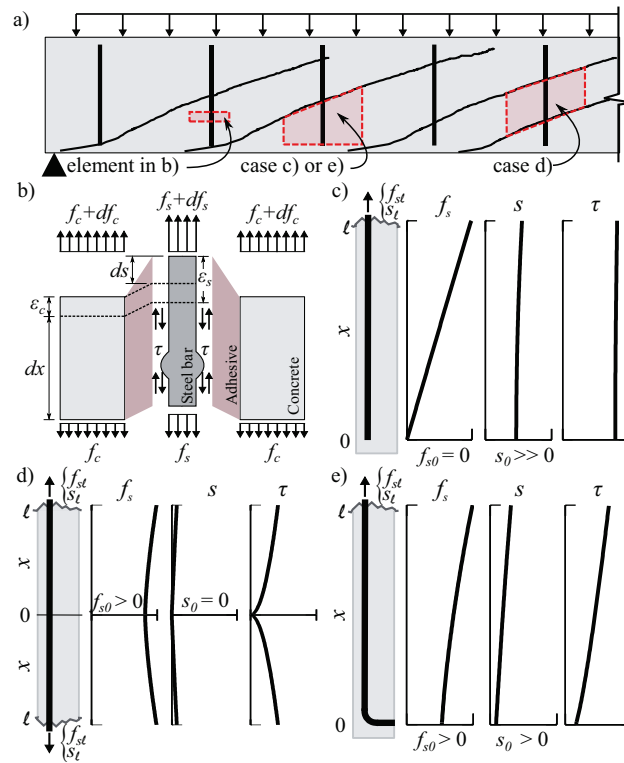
a) Different types of embedded bars and boundary conditions in a shear cracked RC member, b) equilibrium of a bar element and expected axial bar stress, slip and bond stress distribution for c) a straight epoxy-bonded bar, d) a bar between 2 stabilized cracks and e) a hooked stirrup
